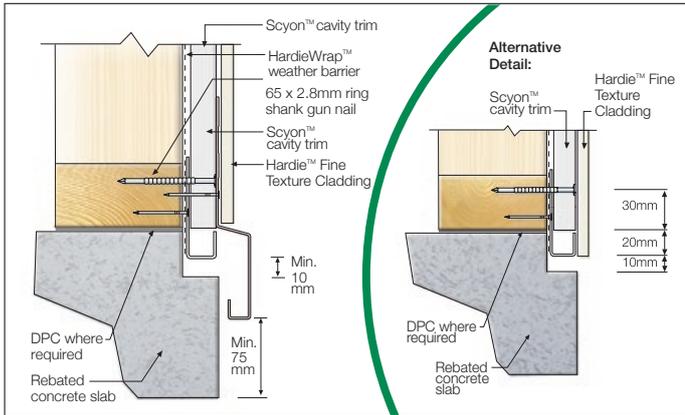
ALTERNATIVE SLAB EDGE DETAILS
